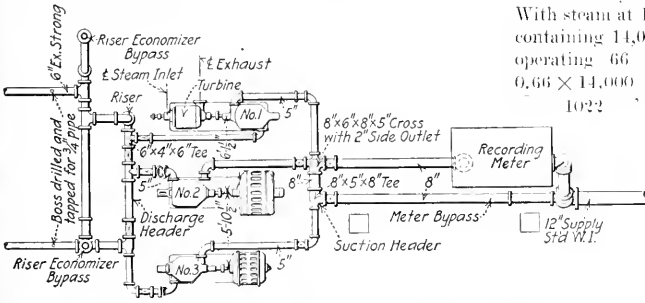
PLAN OF PIPING AT BOILER-FEED PUMPS
